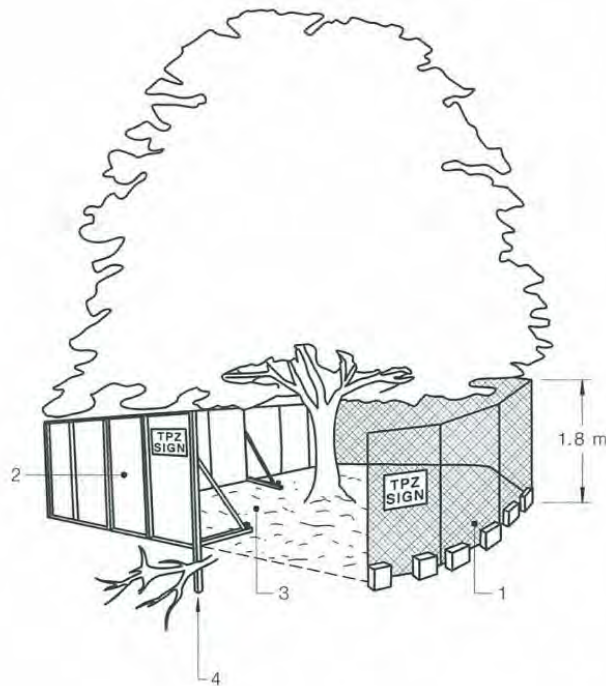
Tree Protection Zone fencing requirements. An example of the requirements for Tree Protection Zone fencing.
